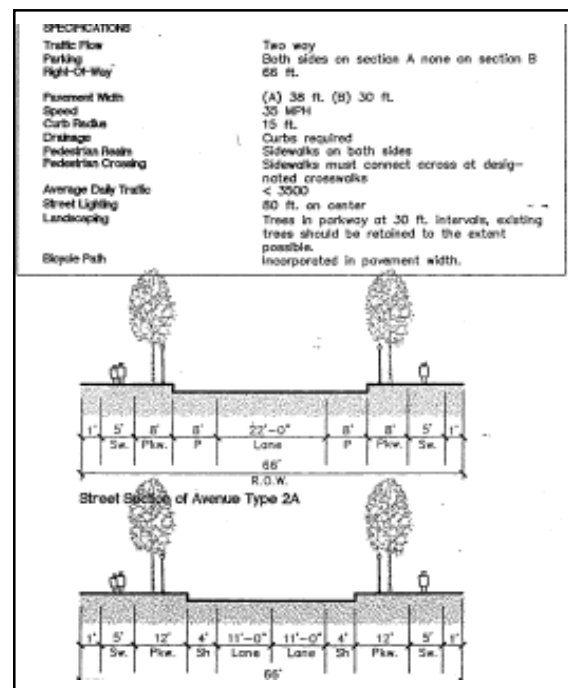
Proposed Robbinsville-Edinburg Road (Rt. 526) cross section.
